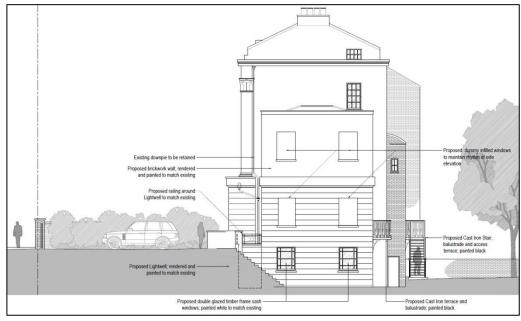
Proposed side elevation (drawing number 123, Revision P02) demonstrating the subordination of the proposed side extension with the host building.
